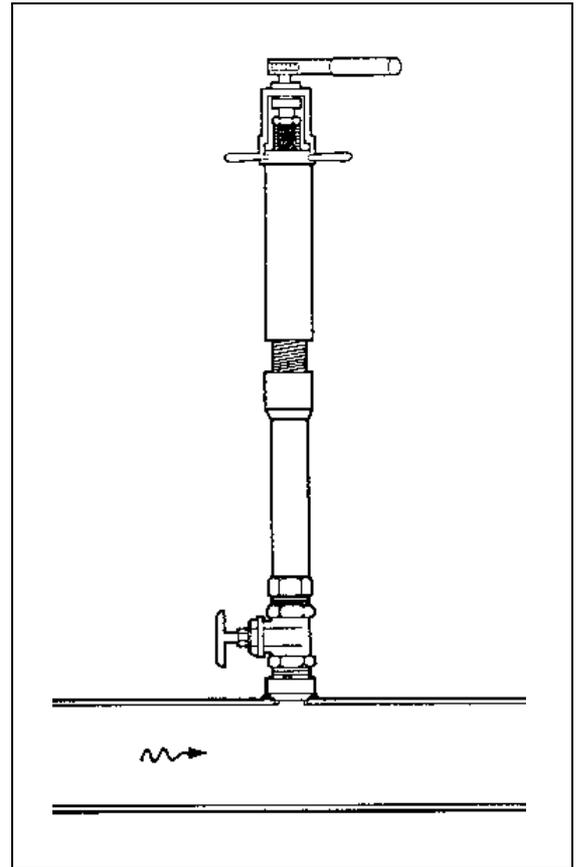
Drilling machine with adapter nipple mounted on unit isolating valve
